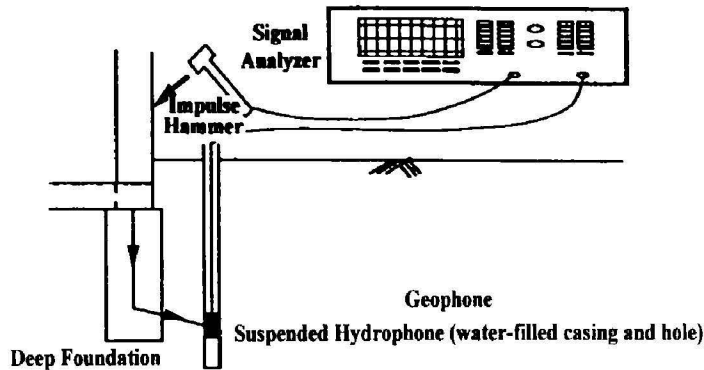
Parallel testing layout (After Olson Eng. Inc.)
